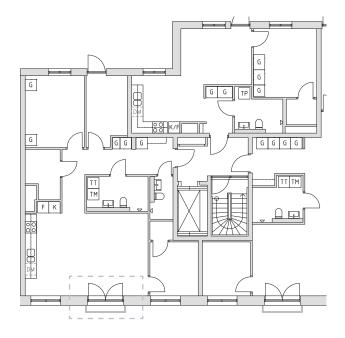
Floor plan, Järntorgsgatan x Brogatan.
